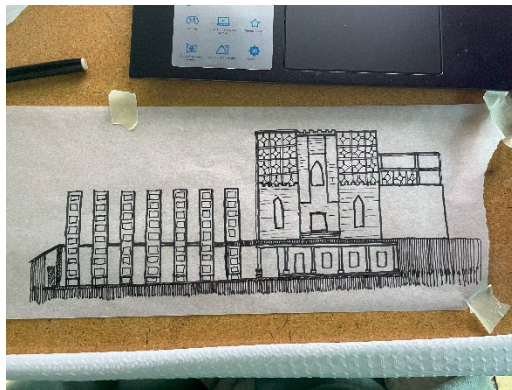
Mausoleum and Sanctum Section Sketch
